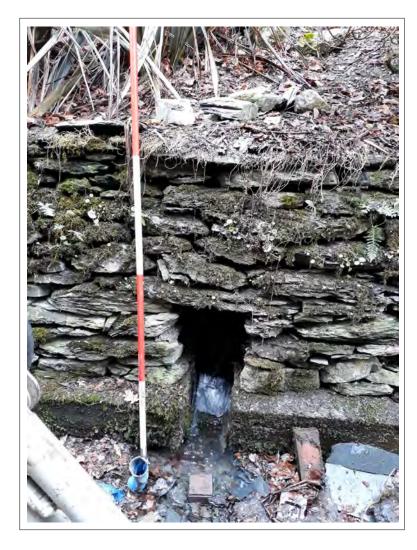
Drainage run to the NE (rear) of the house. Stream in culvert. View NE. 2m scale
